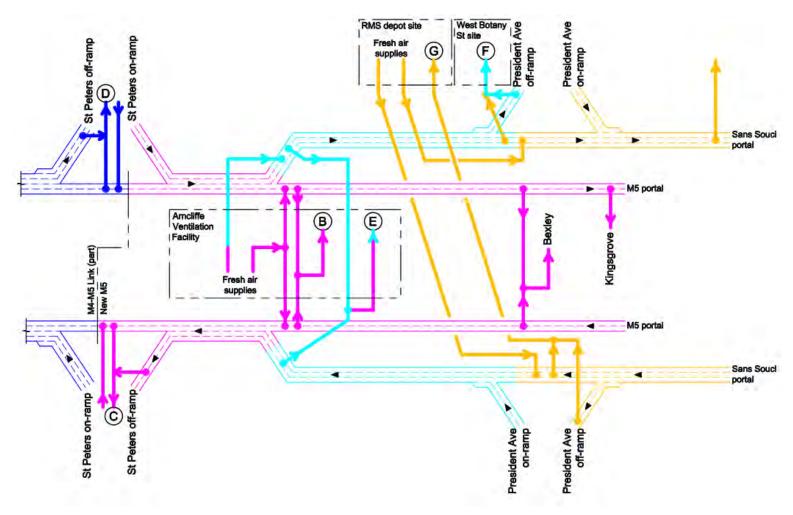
F6 Extension and New M5 tunnel and ventilation network in schematic form.
